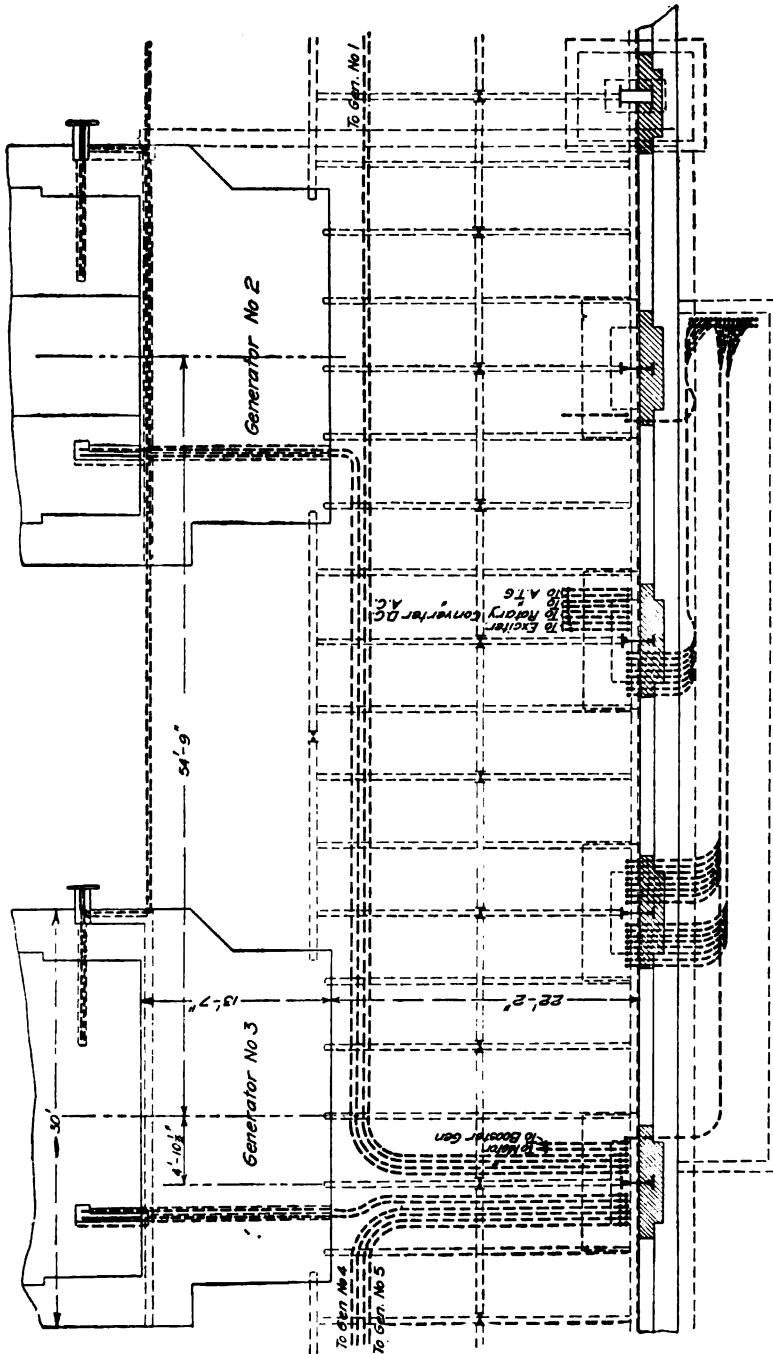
Plan of Engine Room, Showing Layout of Generator Cables (Memphis Street Railway Company).
